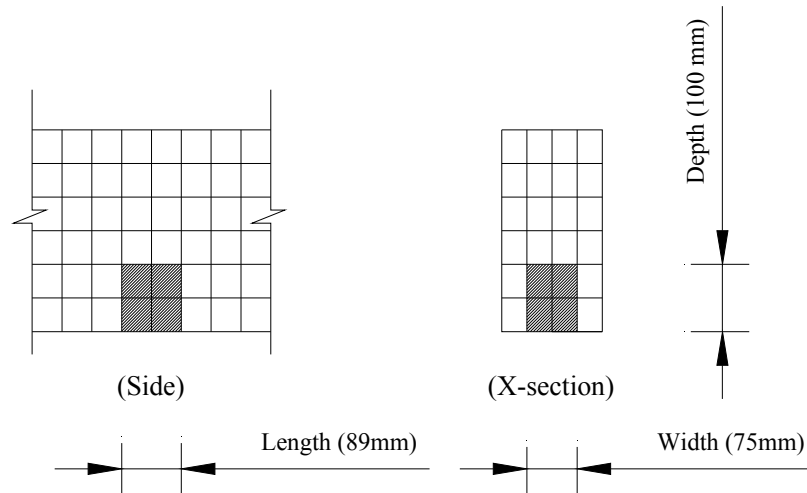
The side elevation and cross sectional view of a bottom honeycomb damage
